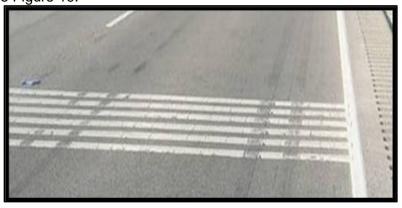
Thermoplastic Transverse Rumble Strip Pavement Markings
